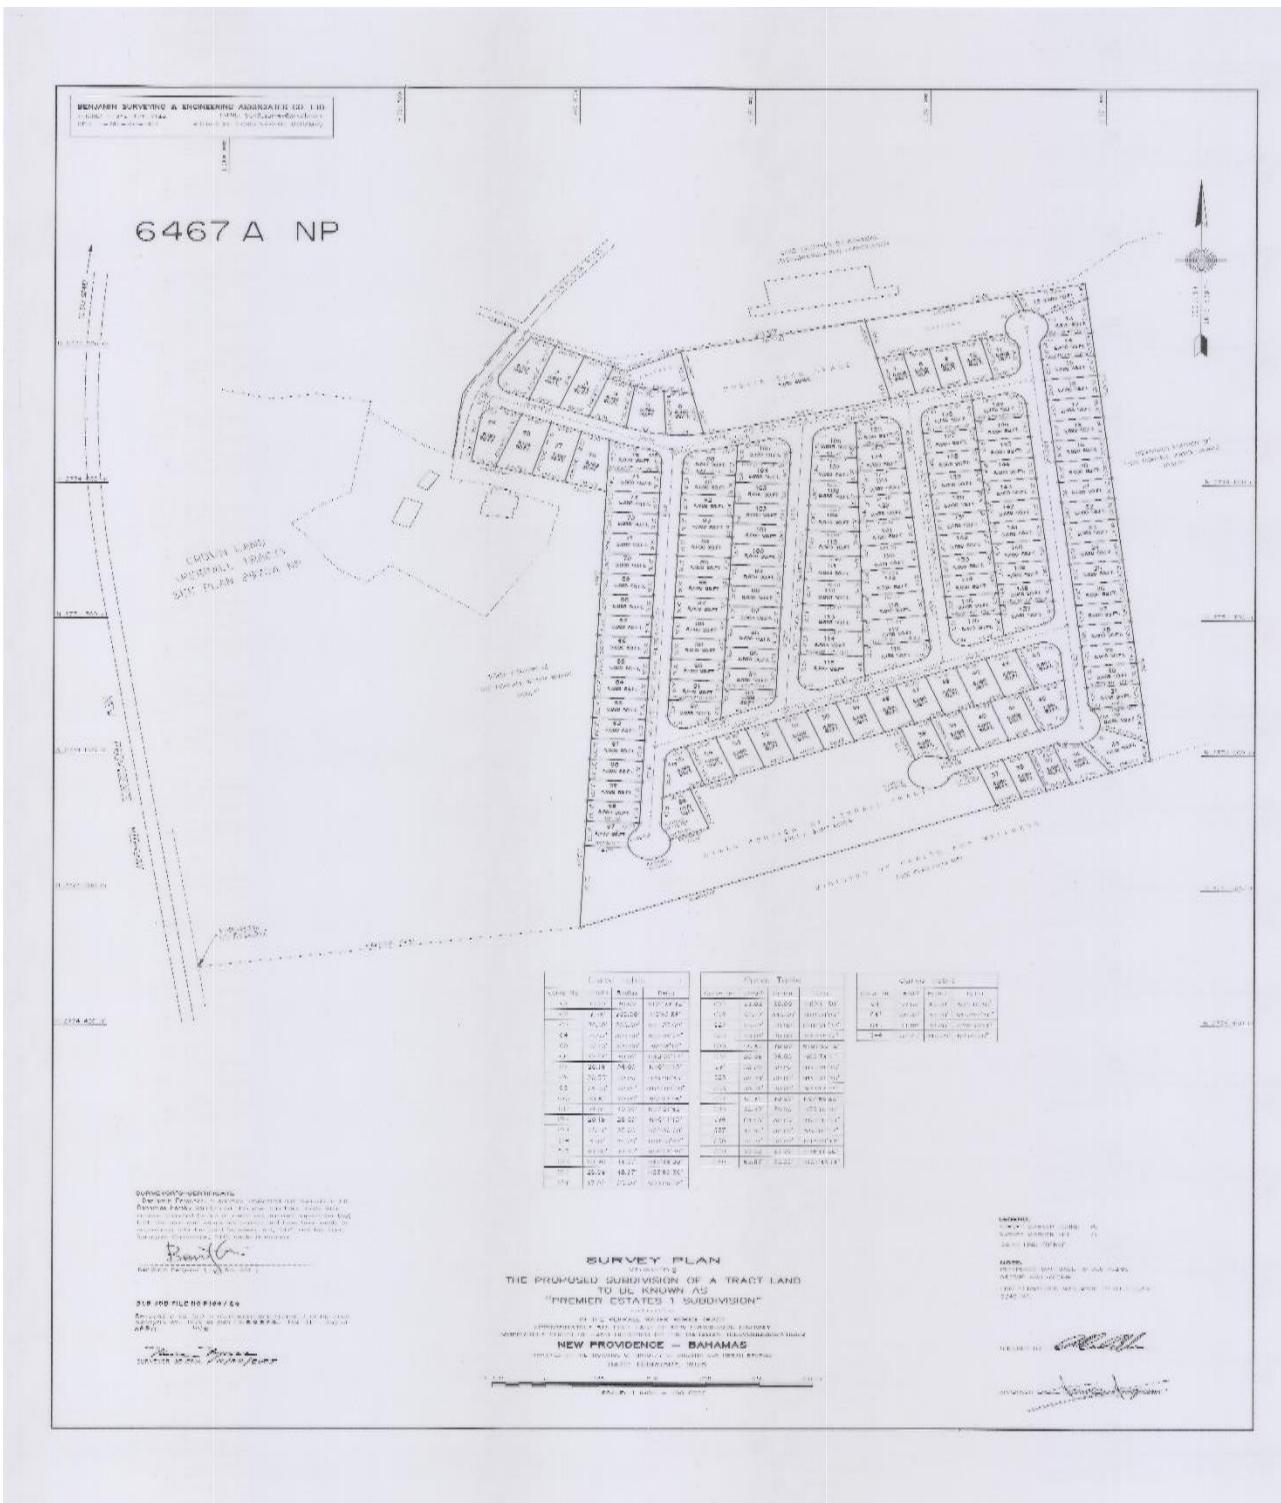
Depicting Survey plan showing Lots and boundaries for Premier estates I.
